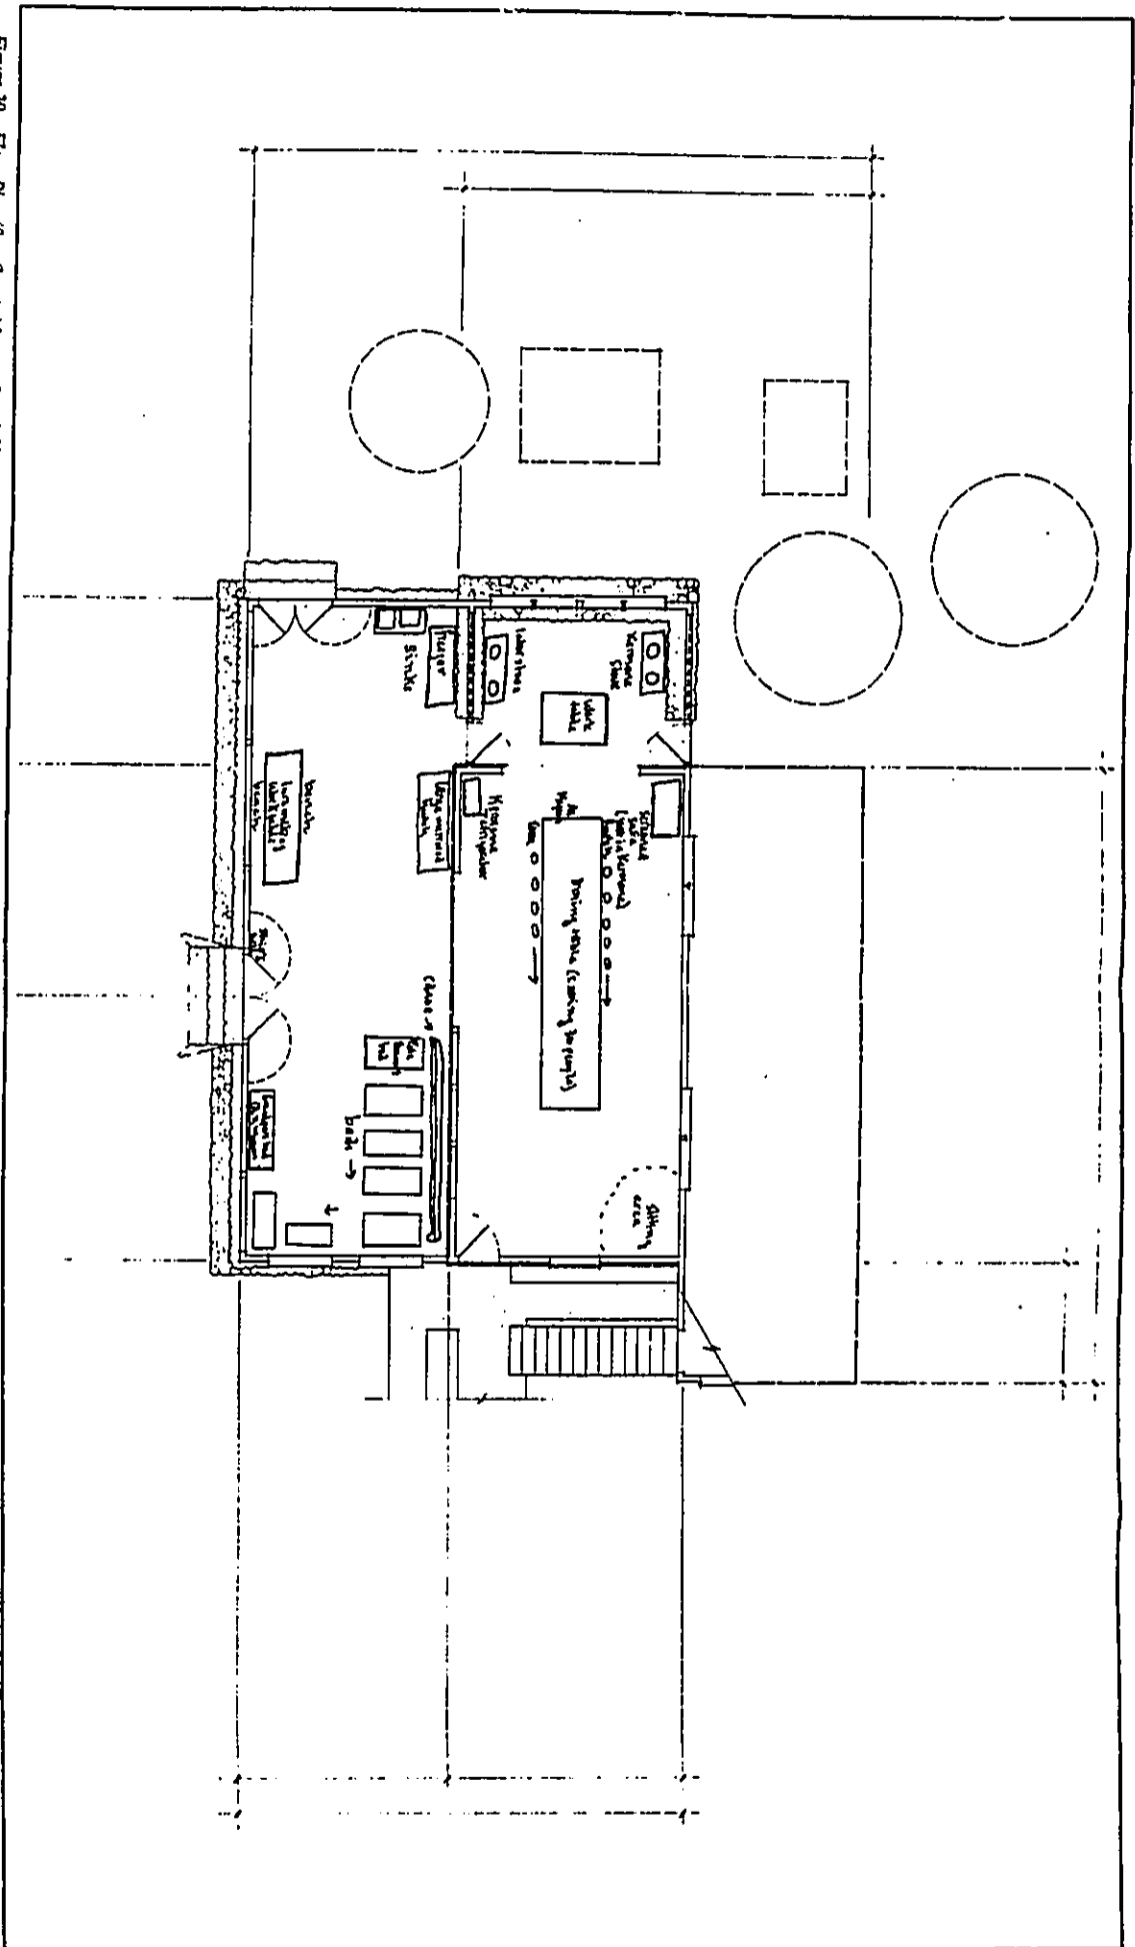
Floor Plan (first floor), Magoon Beach Home at Mahai'ula (ca. 1930s)
